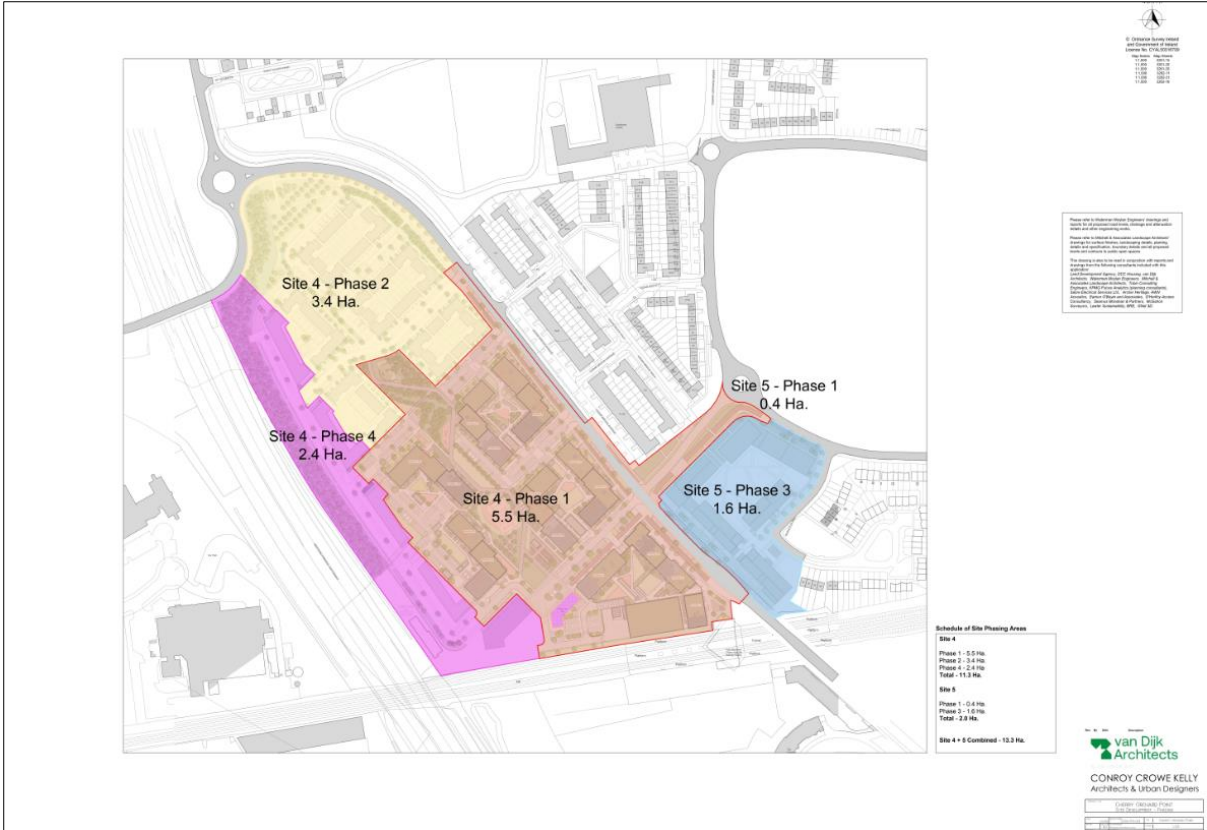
Phasing Plan for the delivery of the Proposed Development on Key Sites 4 and 5 under the Park West Cherry Orchard Local Area Plan 2019 (Source: Van Dijk Architects and Conroy Crowe Kelly Architects).
